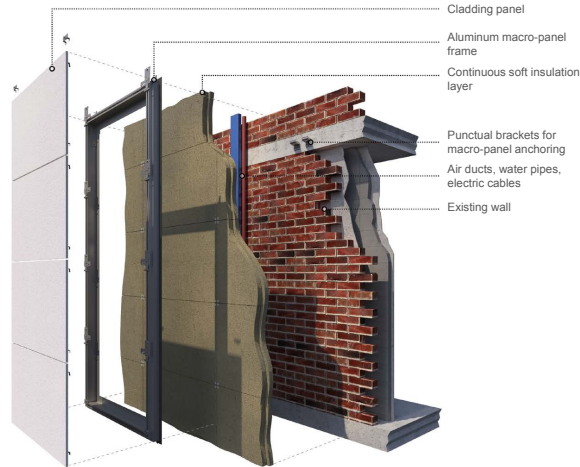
Rendered image of the BuildHEAT façade final concept and its constituent layers
